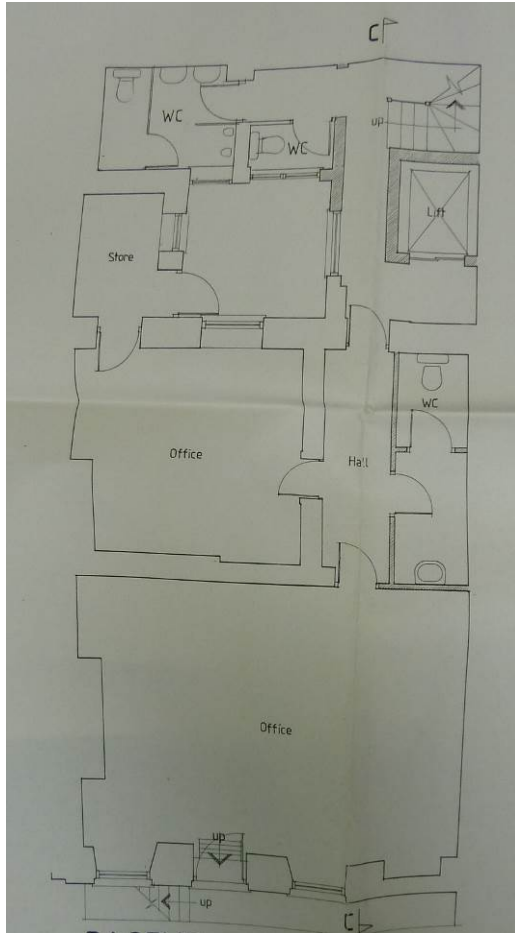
Proposed basement plan, , 1990, Gerald Steer
